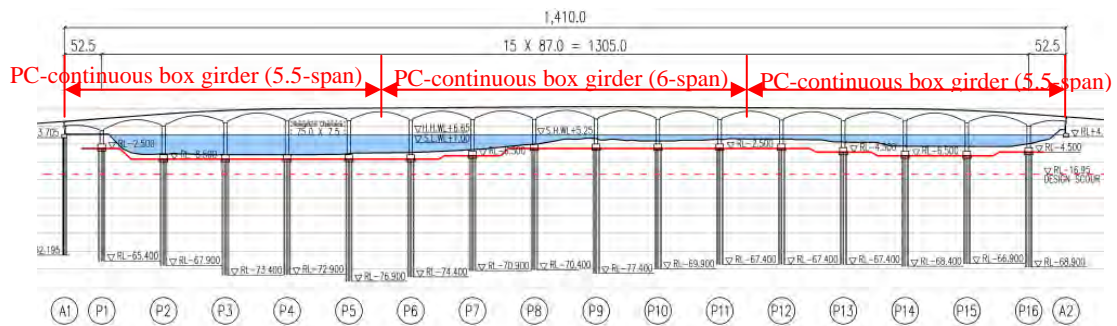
Concept of Continuity in Gumti Bridge Girder
